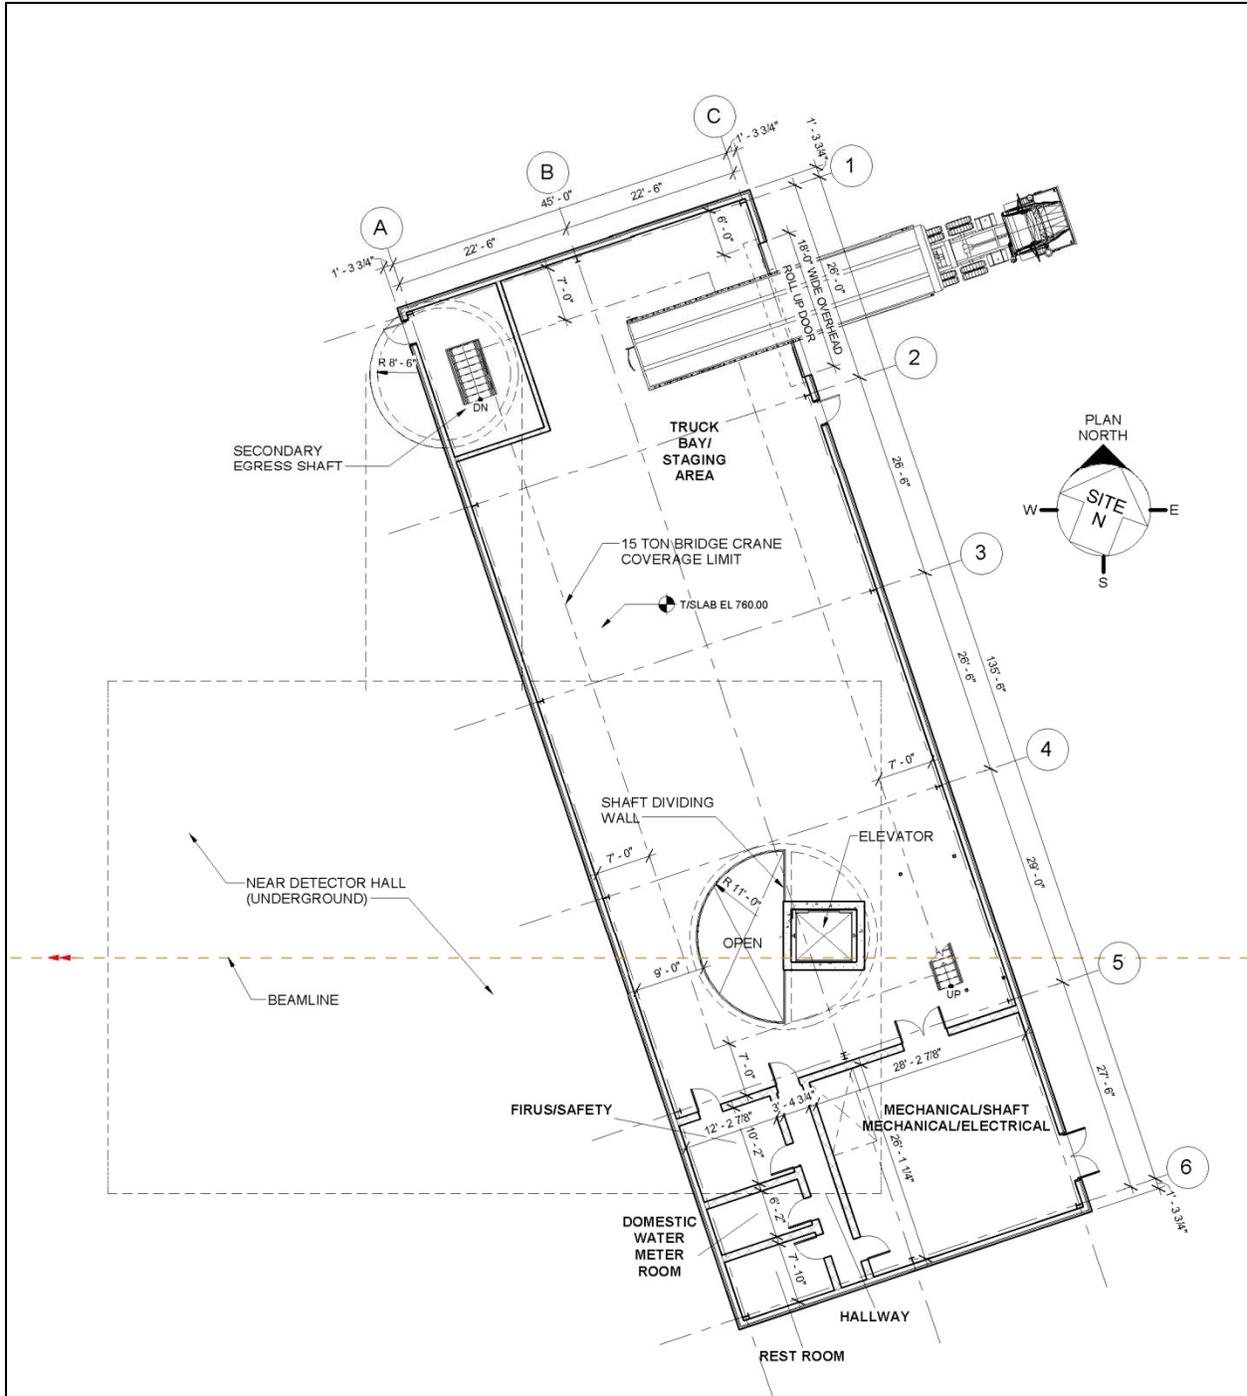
Near Detector Service Building (LBNF-40) Floor Plan
